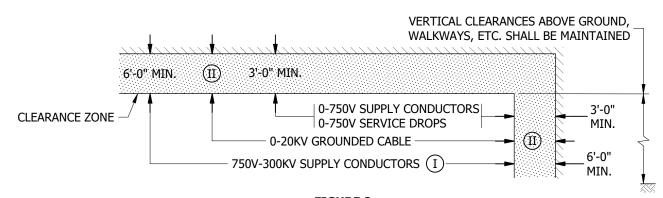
UNDER OR THRU BRIDGES, VIADUCTS OR SIMILAR STRUCTURES
